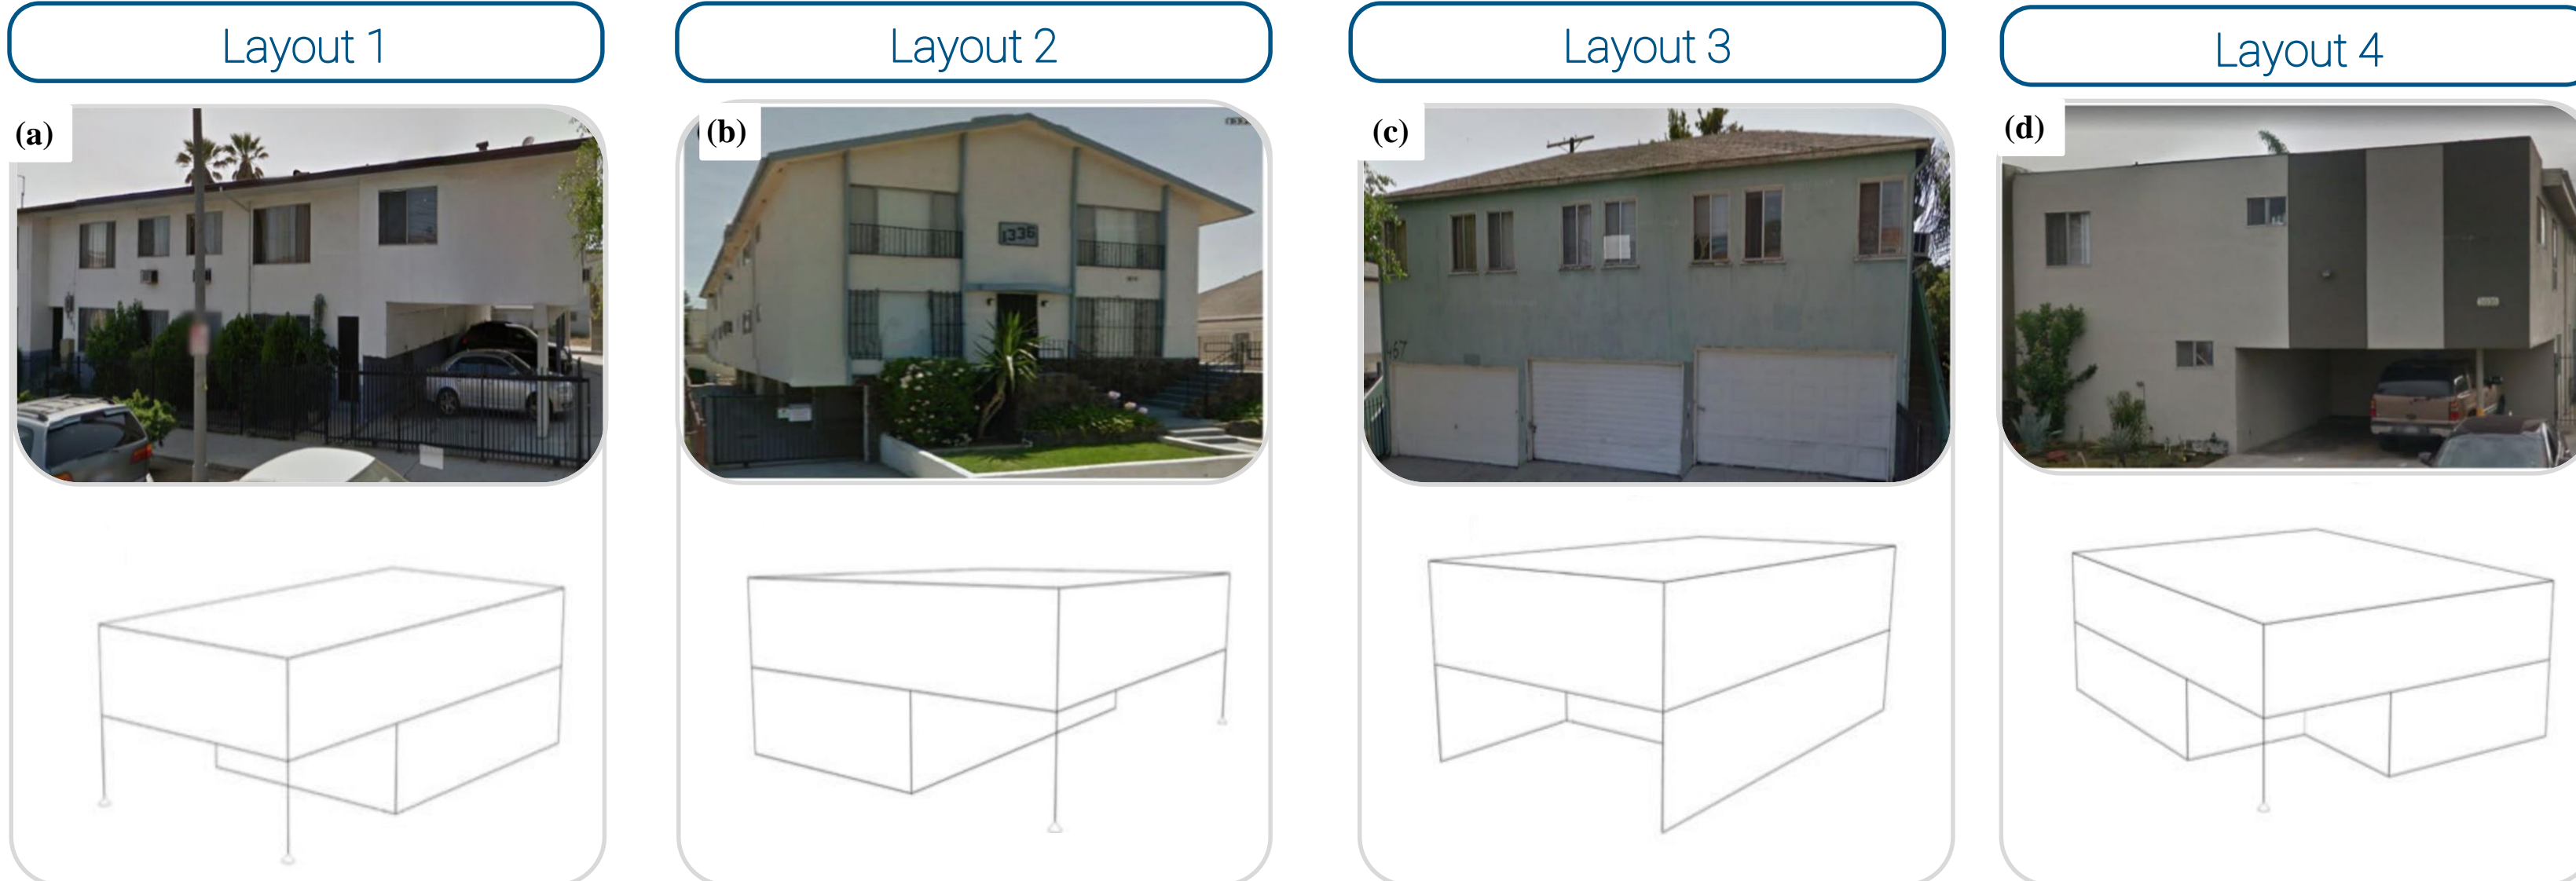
Schematic isometric views of typical SWOF woodframe building configurations (Burton et al. 2019) identified from survey (top), along with photos of typical SWOF woodframe building configurations (bottom): a Layout 1 (L1), b Layout 2 (L2), c Layout 3 (L3) and d Layout 4 (L4).
